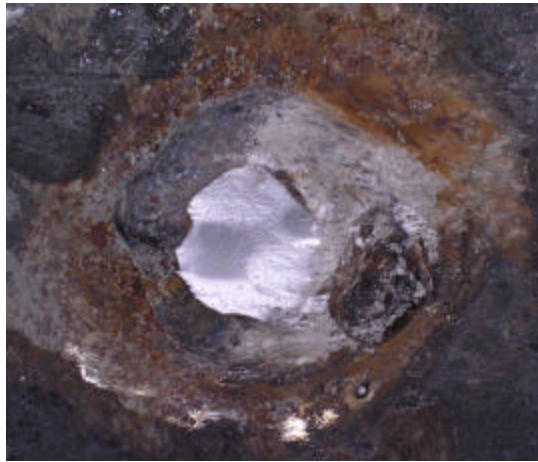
Failure of stud through stem (Specimen POSST-ST(F))
